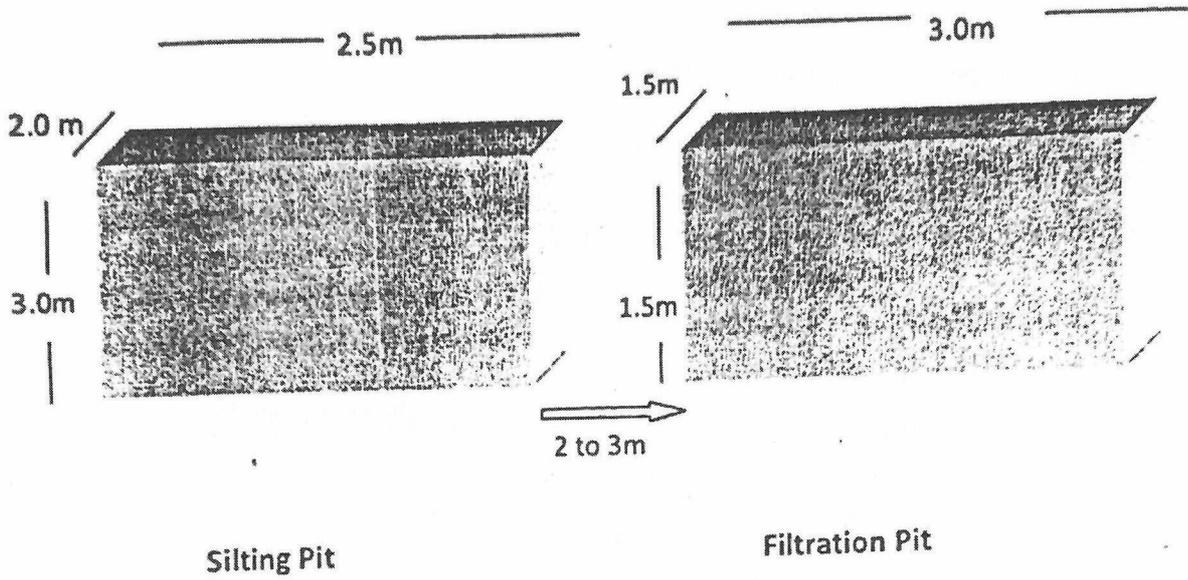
RAINWATER RECHARGE SYSTEM AT INJECTION WELL FROM ROOFTOP, ROAD/ PAVEMENT AREA
